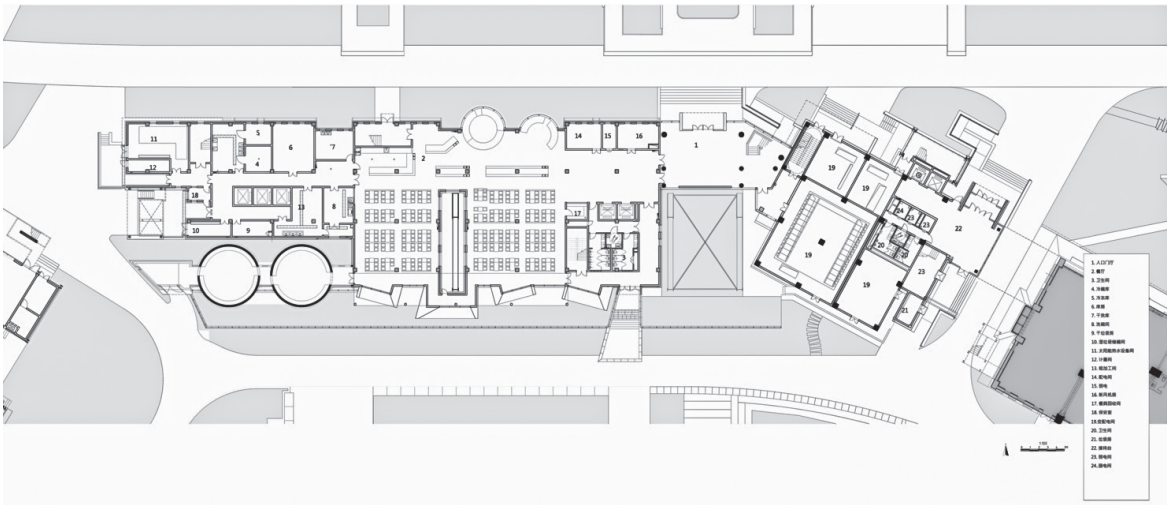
Employee cafeteria and N1-2 transfer station ground floor plan
